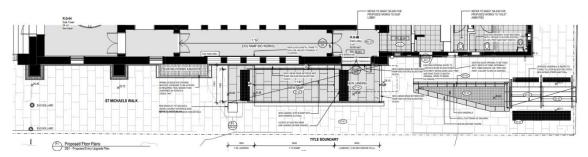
Extract from Proposed Plan of St. Michael's Walk Entrance. Source: Trethowan Architecture, 2024.
